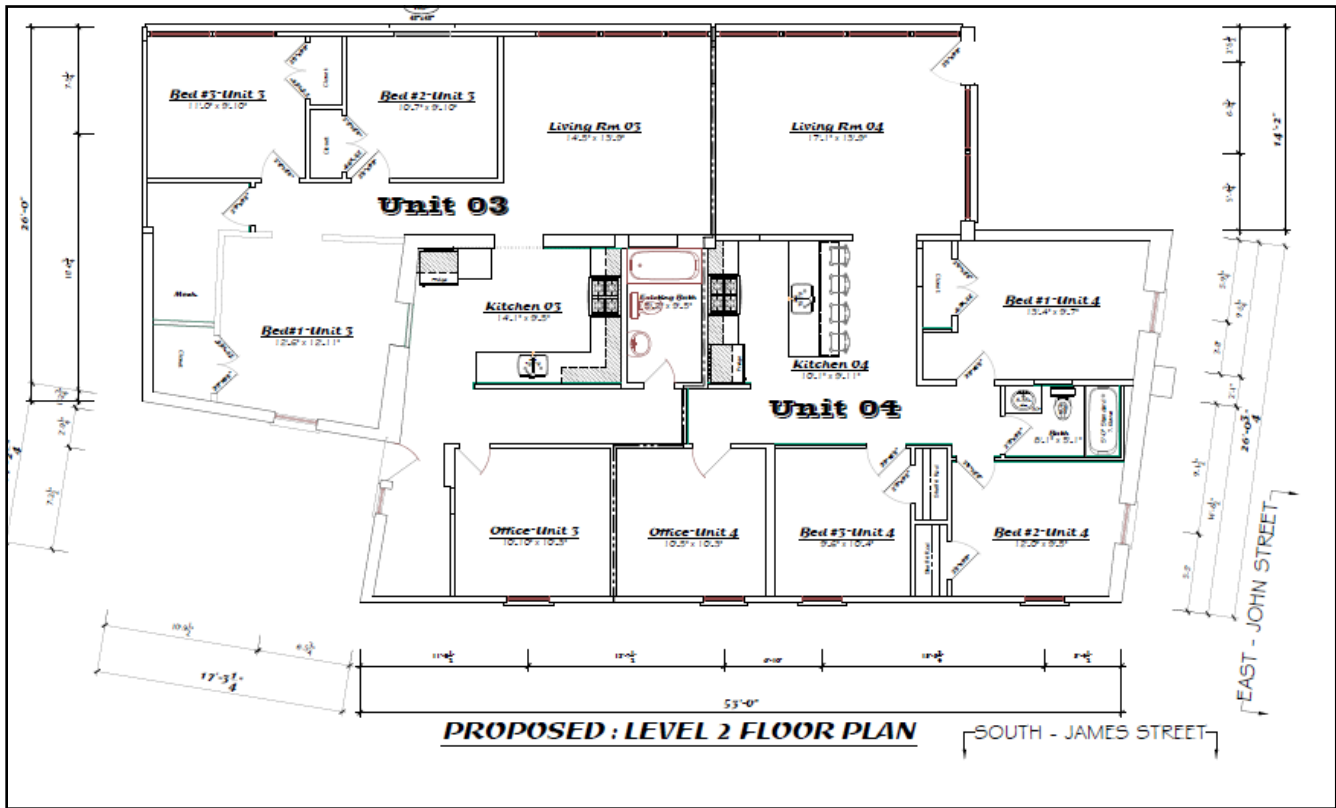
Floor Plan, Second Floor (Source: Annable Design)
